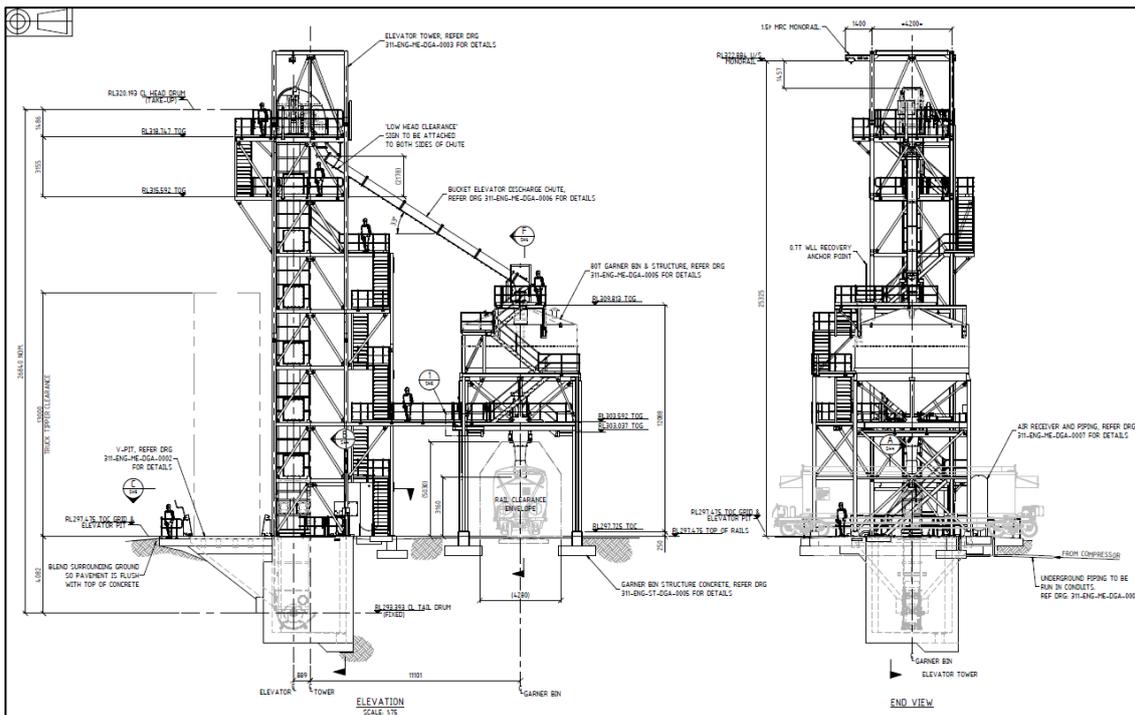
Proposed Rail Loading Facility elevation plans
